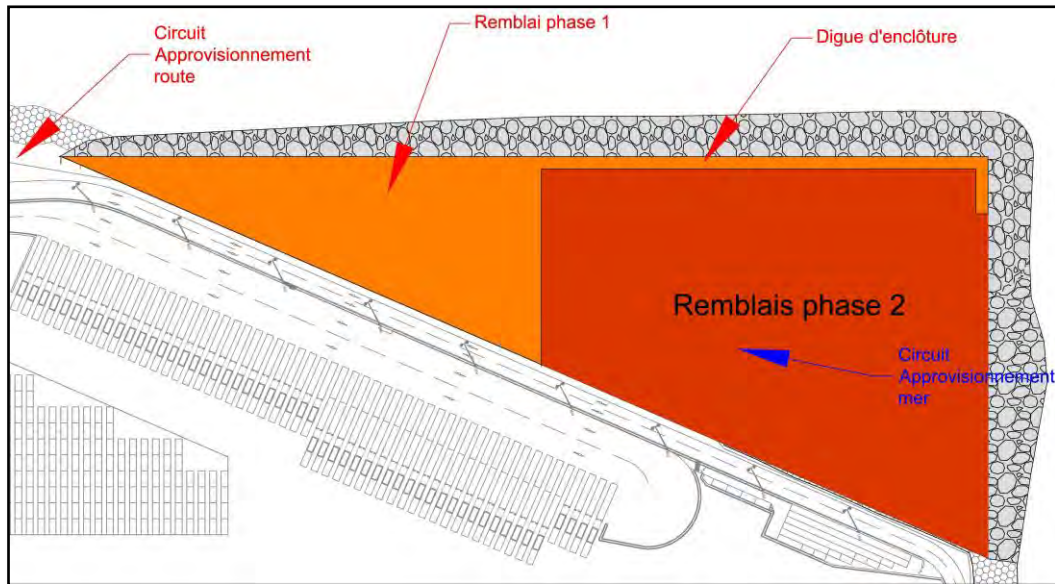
Plan view of stage 1 and stage 2 backfilling (drawing: Artelia (2015))
